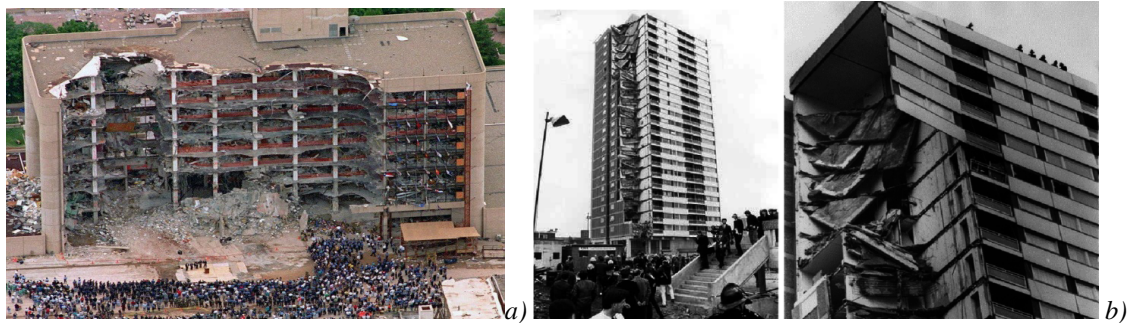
Examples of progressive collapses: a) Alfred P. Murrah Federal Building, Oklahoma City, 1995; b) Ronan Point Building, London, 1968.
